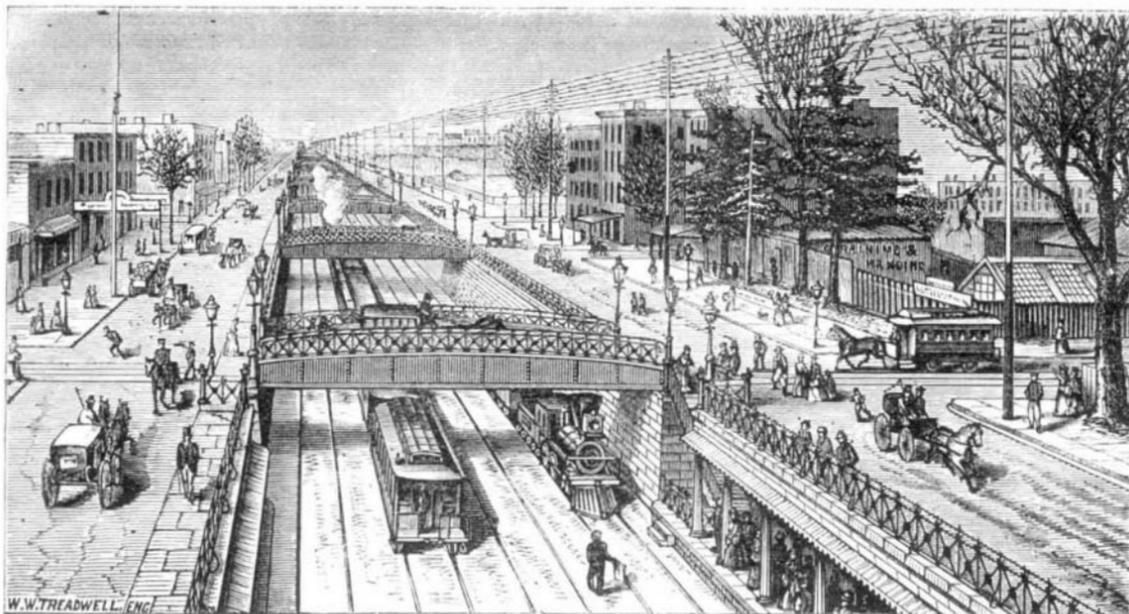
THE UNDERGROUND RAILWAY, NEW YORK CITY.—PASSENGER STATION AT 125th ST.—THE HARLEM OPEN CUT AND CROSS STREET BRIDGES.
